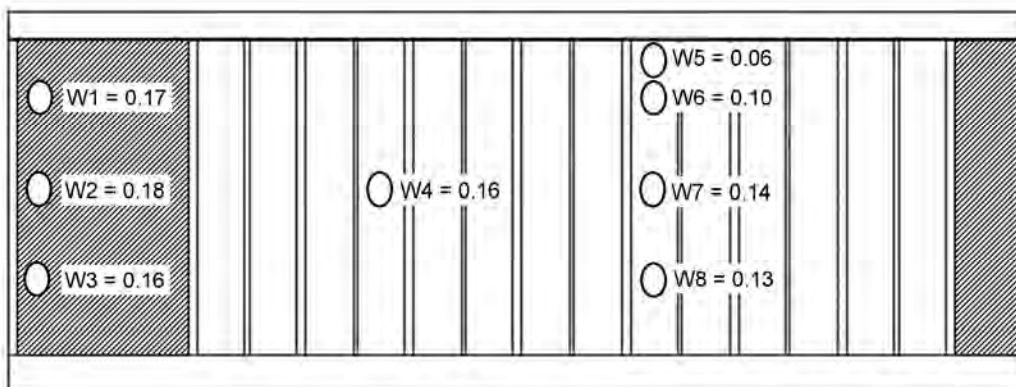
Catch ratio of WDR on the west facing test house wall. Total in measurement period 2004-2007. The wall facing south has 0.09, facing east has 0.00 and facing north has 0.01.
